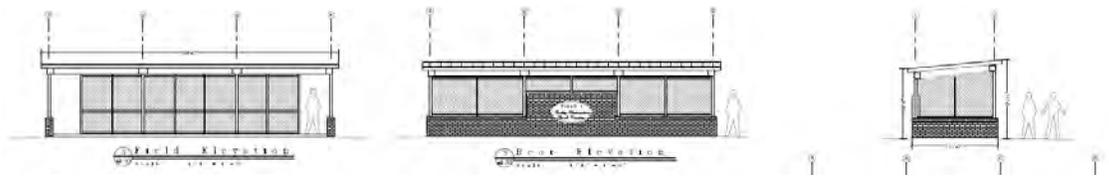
Front, Side, and Rear Elevations of Proposed Dugout Structures
